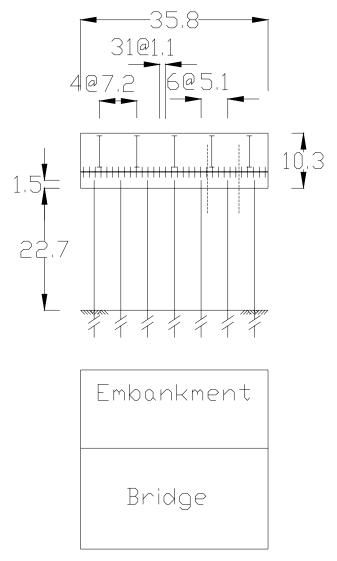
Telegraph Road IAB elevation and plan view (adapted from project construction plans).
